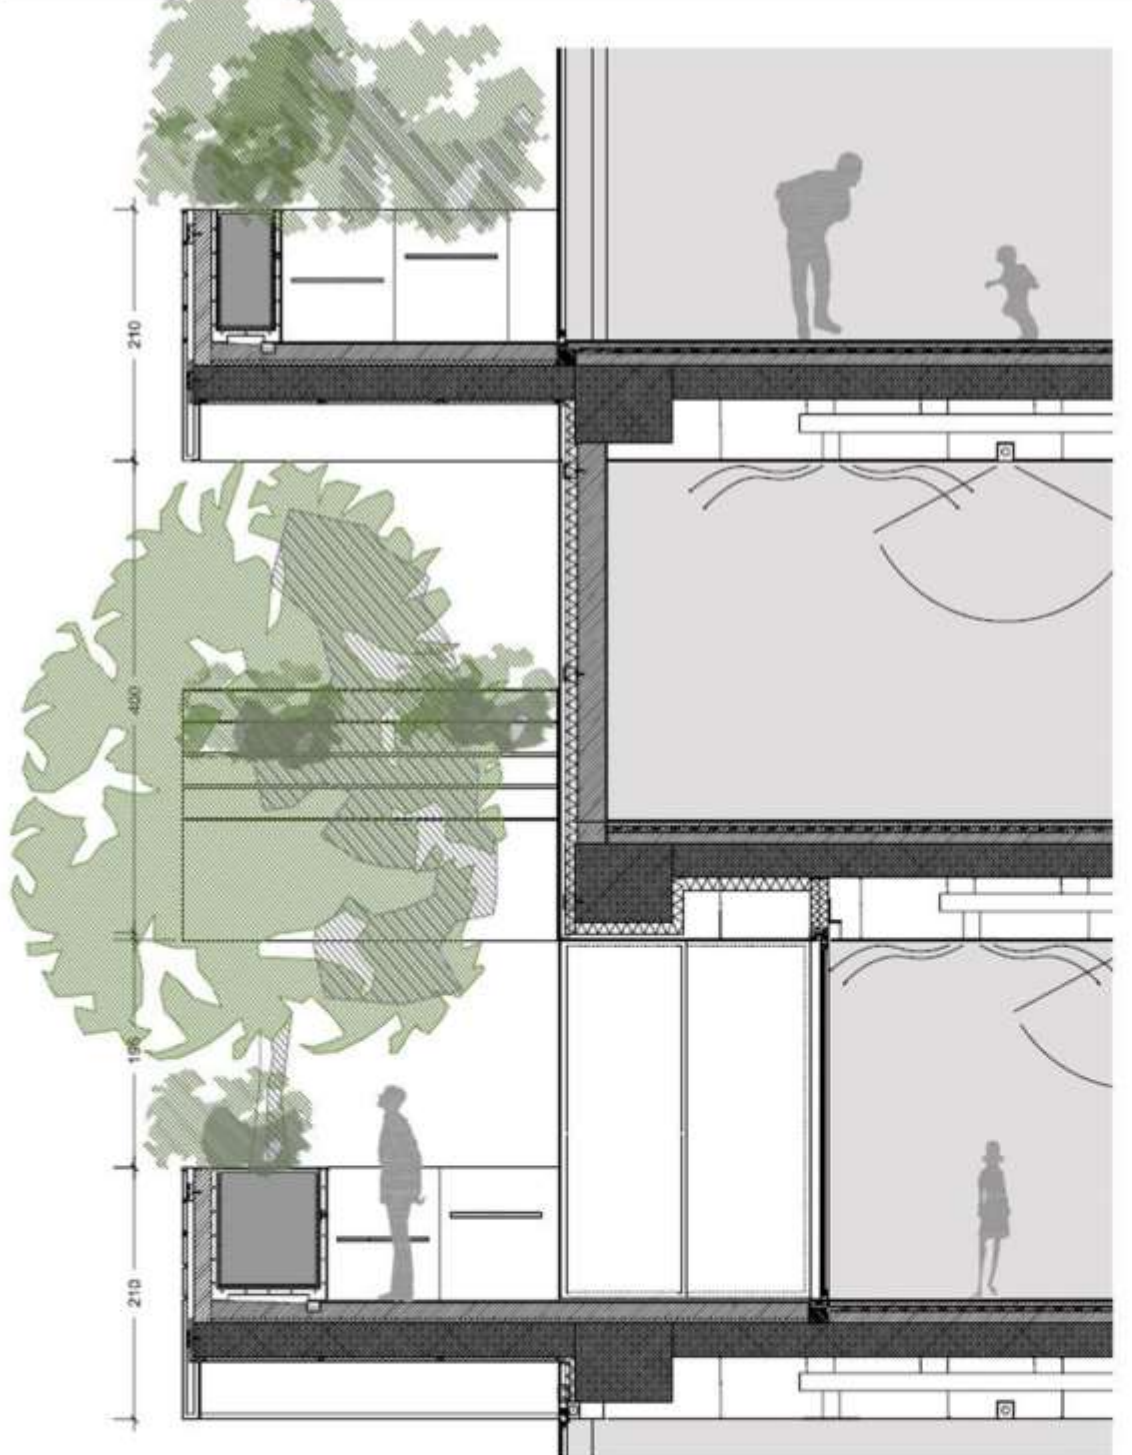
Detail section showing cantilevered terraces. © Stefano Boeri Architetti
